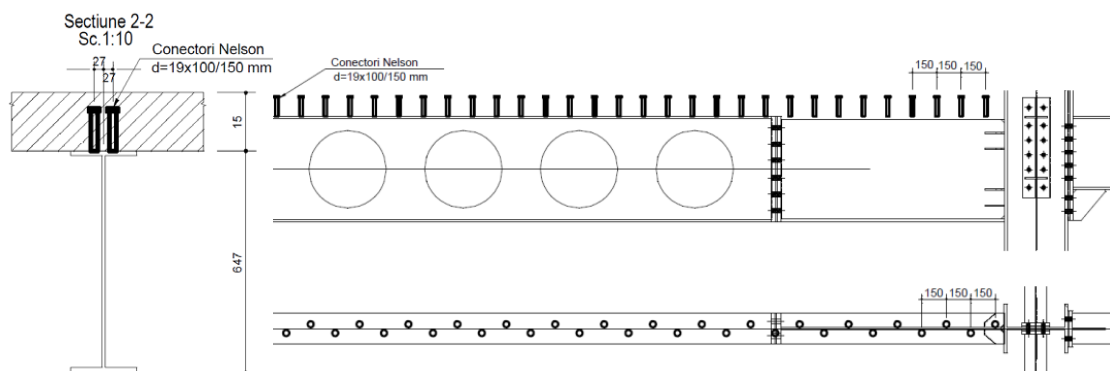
Composite IPE450 beam details: Cross-section; Beam-column connection detail.
